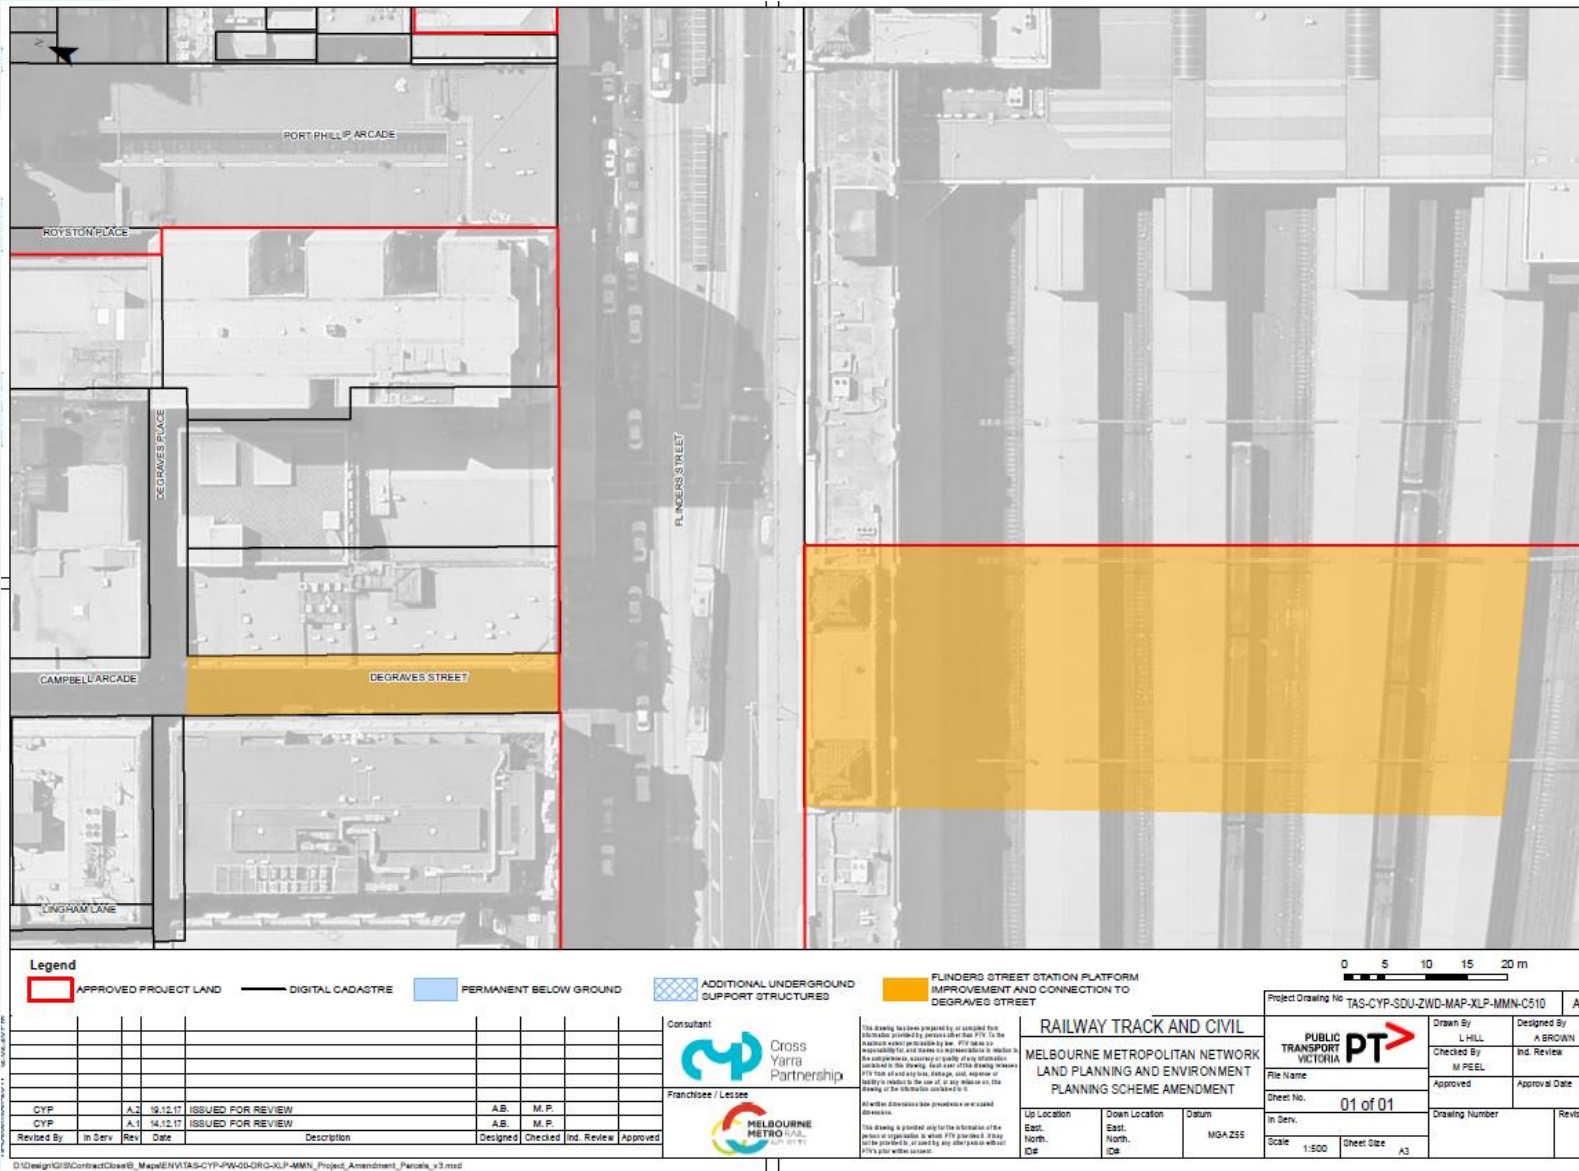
ADDITIONAL PROJECT LAND REQUIRED FOR FLINDERS STREET STATION PLATFORM IMPROVEMENTS AND CONNECTION TO DEGRAVES STREET
